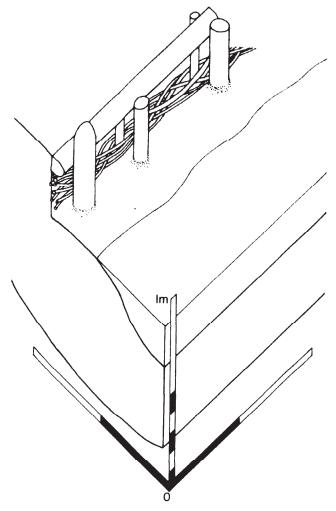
Middle Saxon waterfront revetment at Bridge Street, site 16
